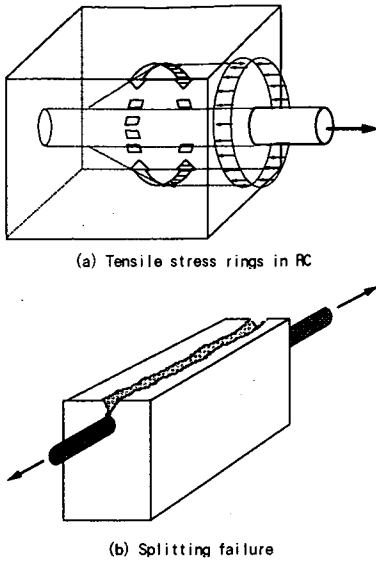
Cover concrete failure¹⁹⁾.
